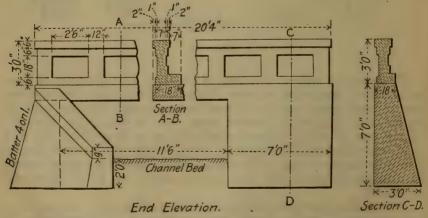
Showing Raised Parapet on Skew Bridge extended over Straight Parapet Retaining Wall
